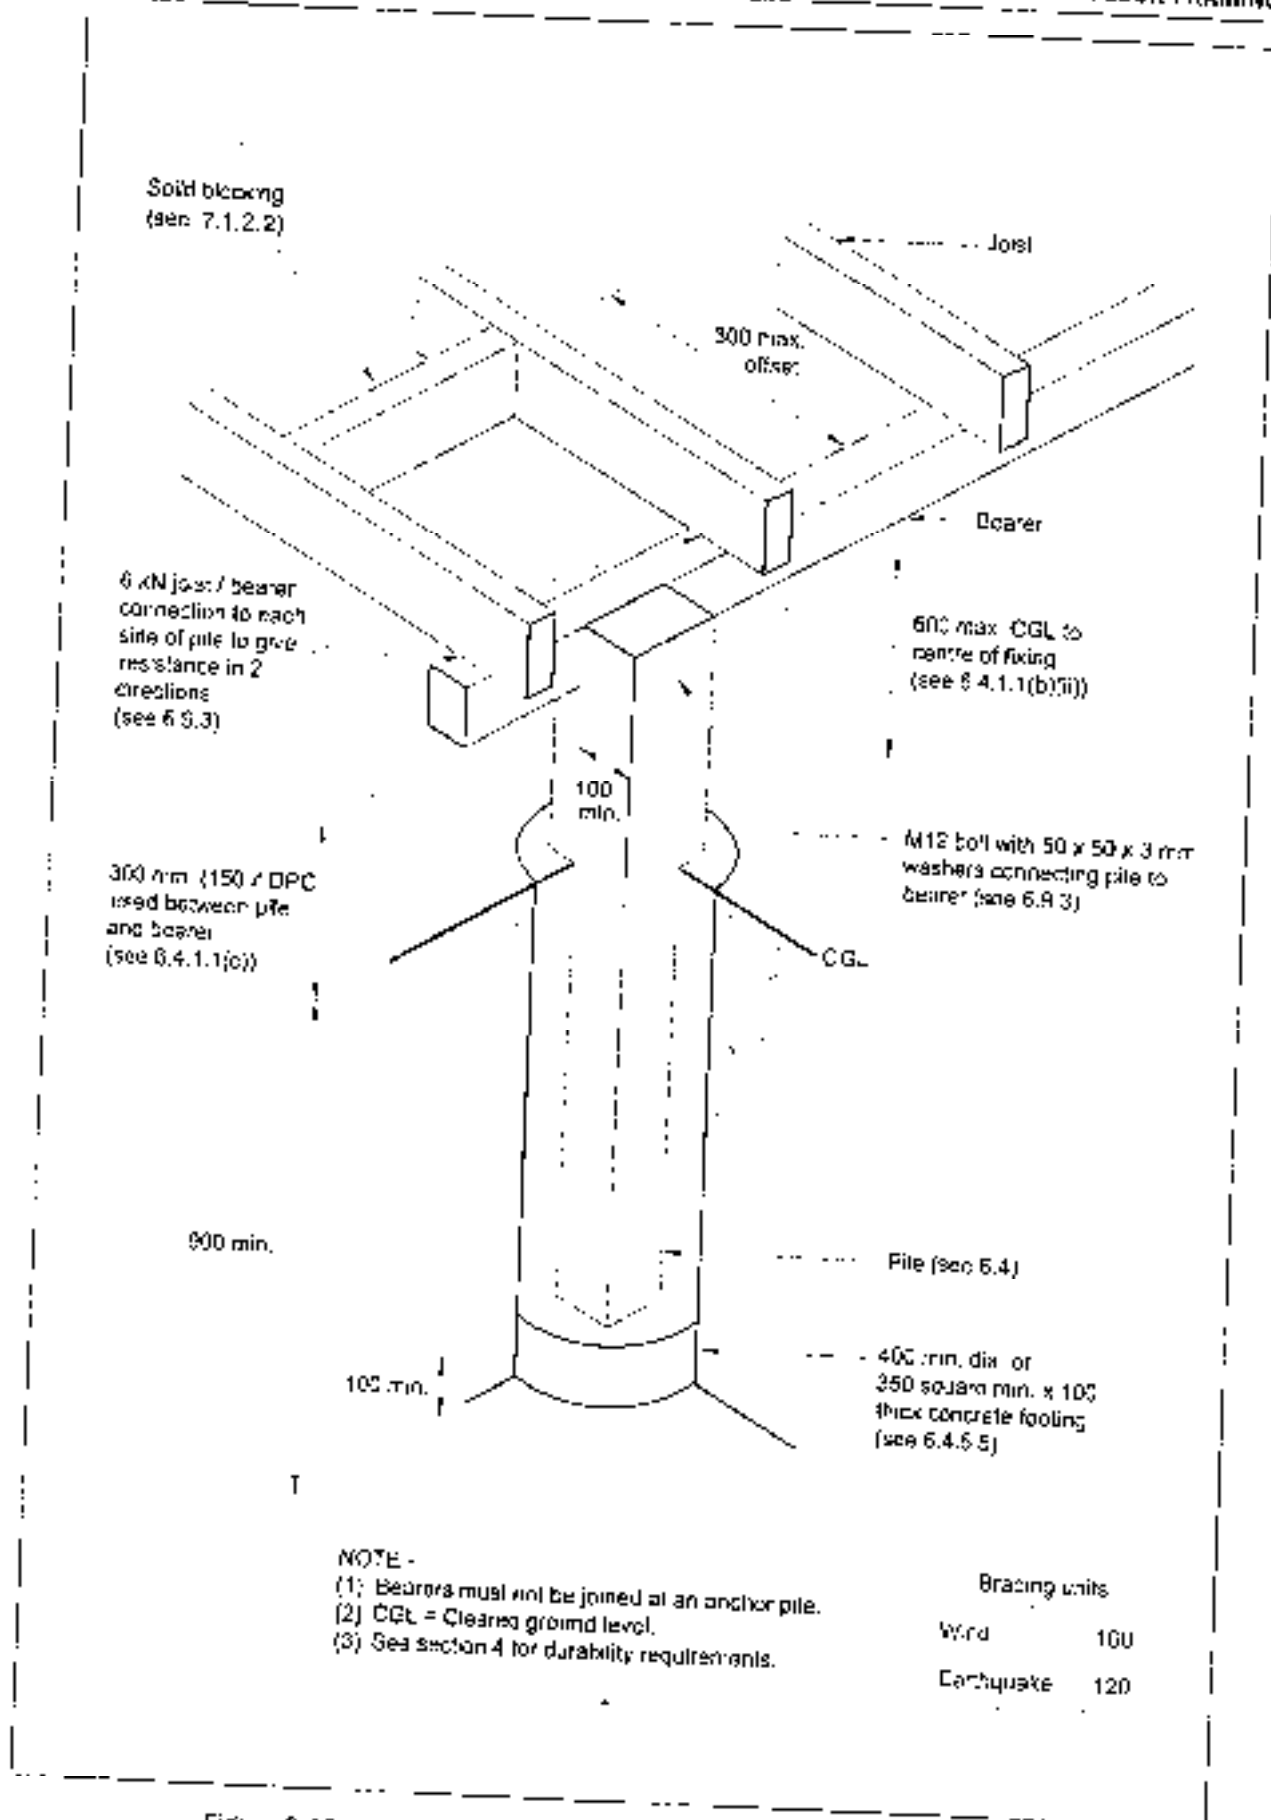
Anchor pile directly connected to bearer only (see 6.9)
